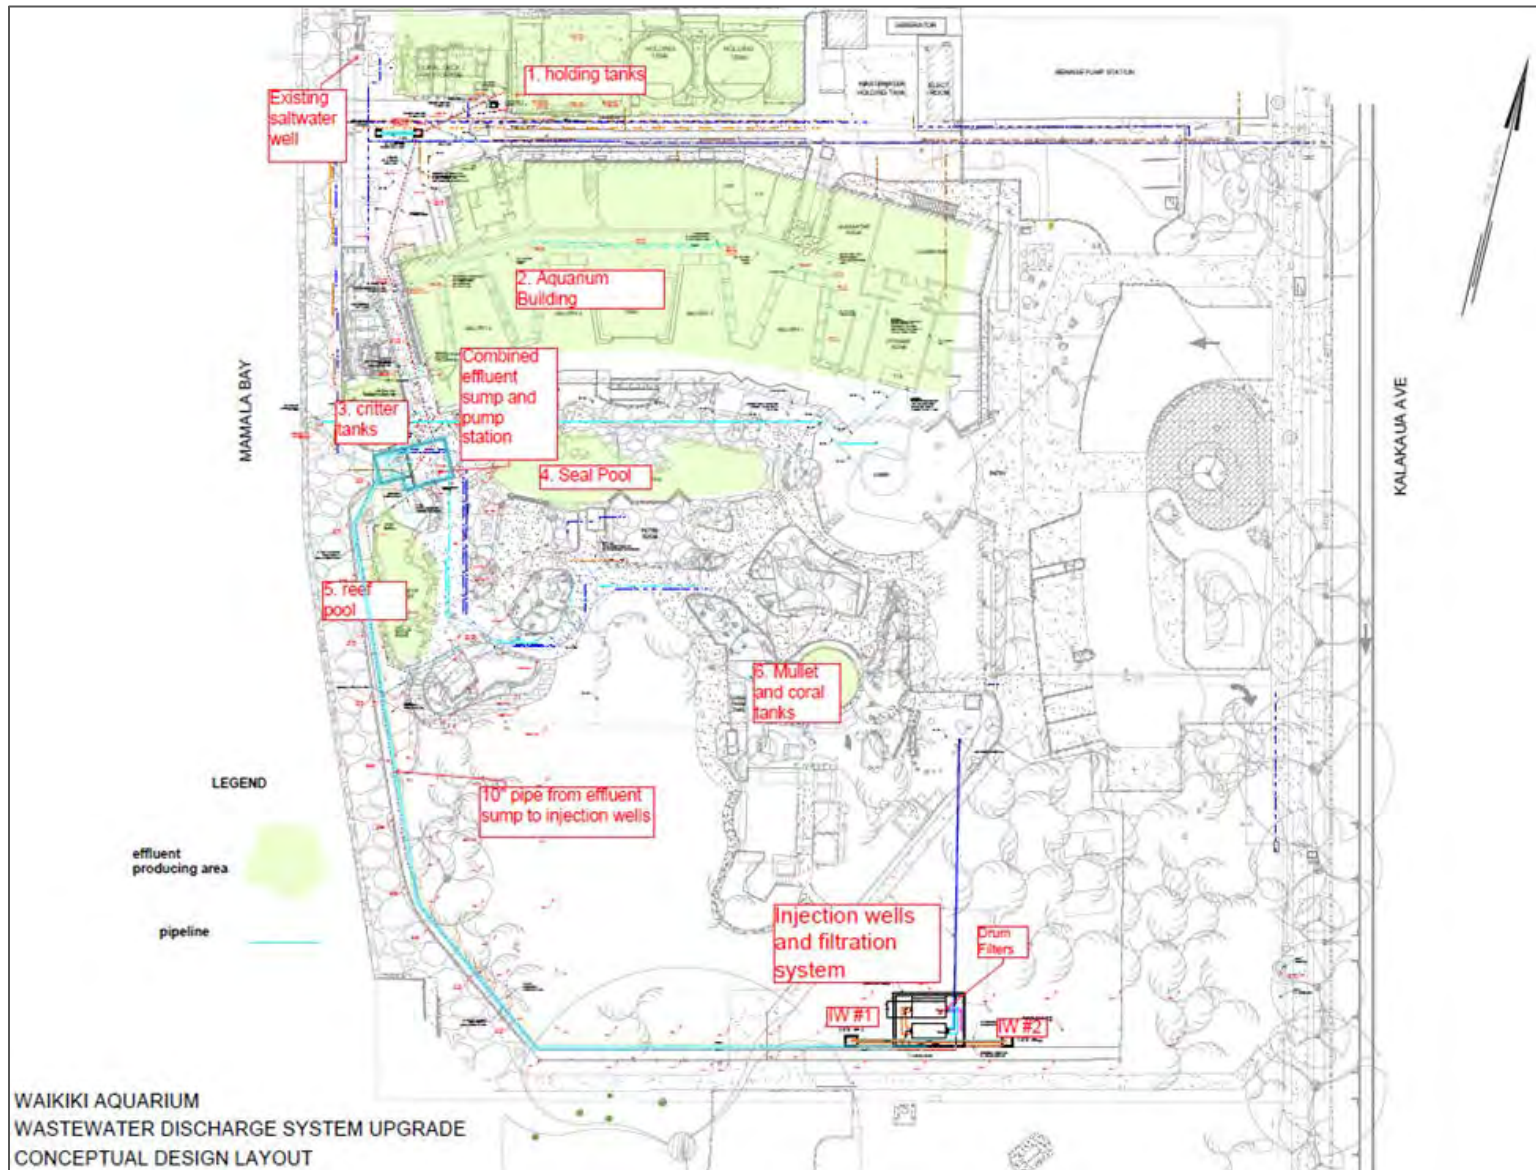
Site plan showing the six effluent-producing area (highlighted in light green).
